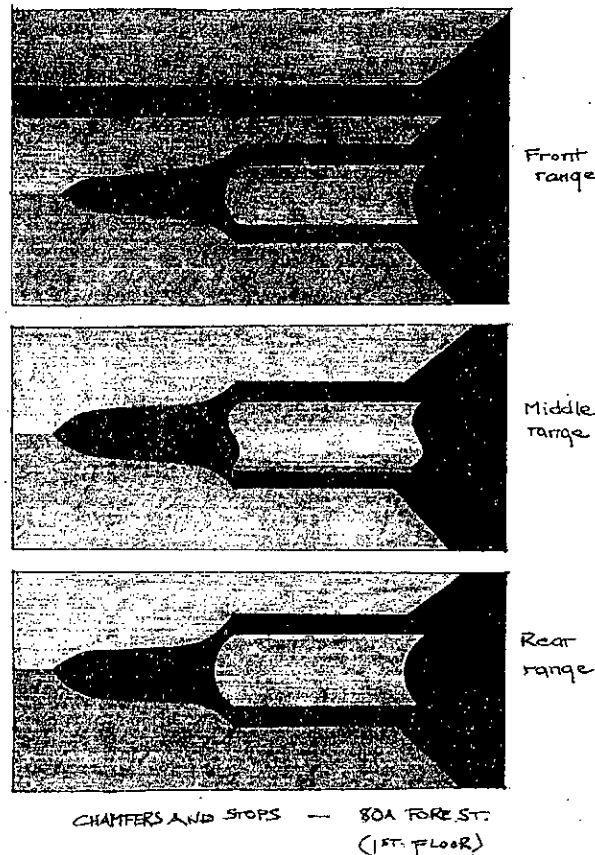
Range 3. Decorative chamfer mouldings and run-out stops to ceiling beams over front, central and rear first floor rooms
